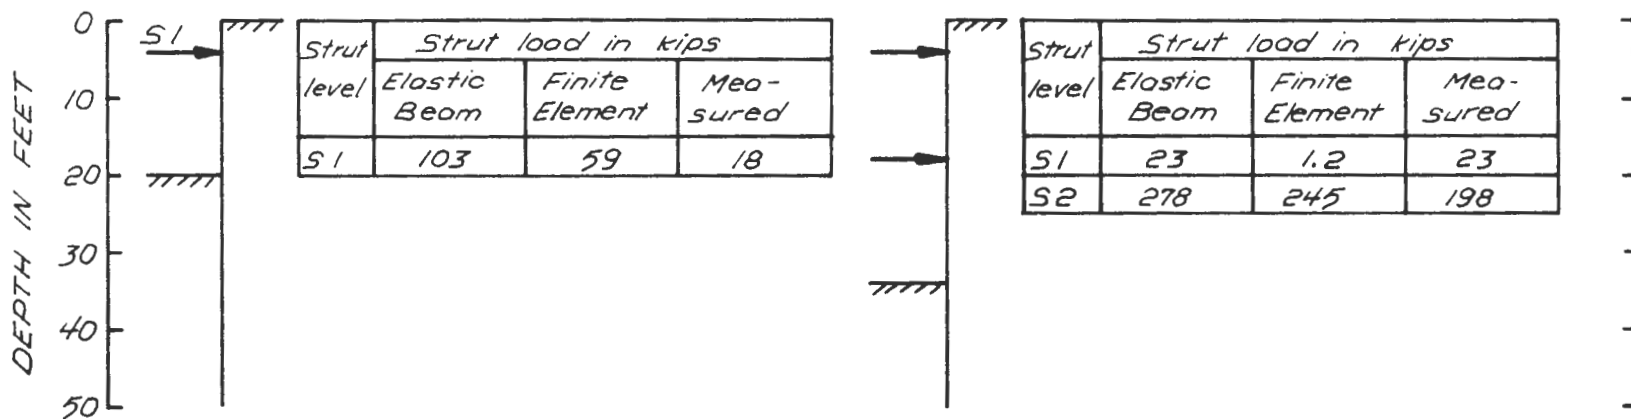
STRUT LOADS DURING EXCAVATION TEST SECTION B
